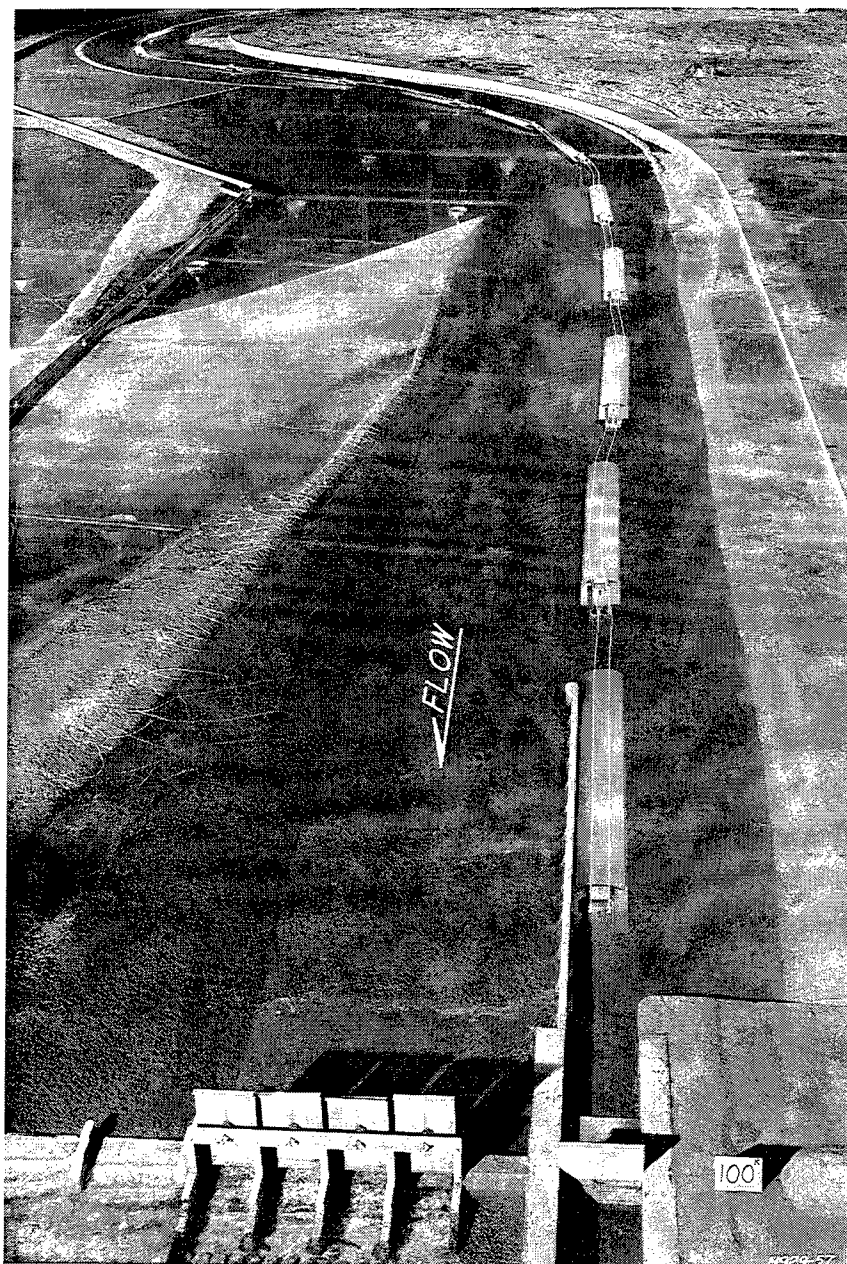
Plan B, looking upstream, discharge 100,000 cfs. Path of up-bound tow leaving the upper lock approach.
